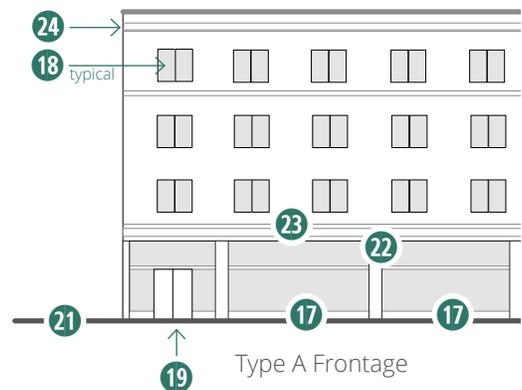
(4). Storefront Building Elevation: Facade Design Requirements
